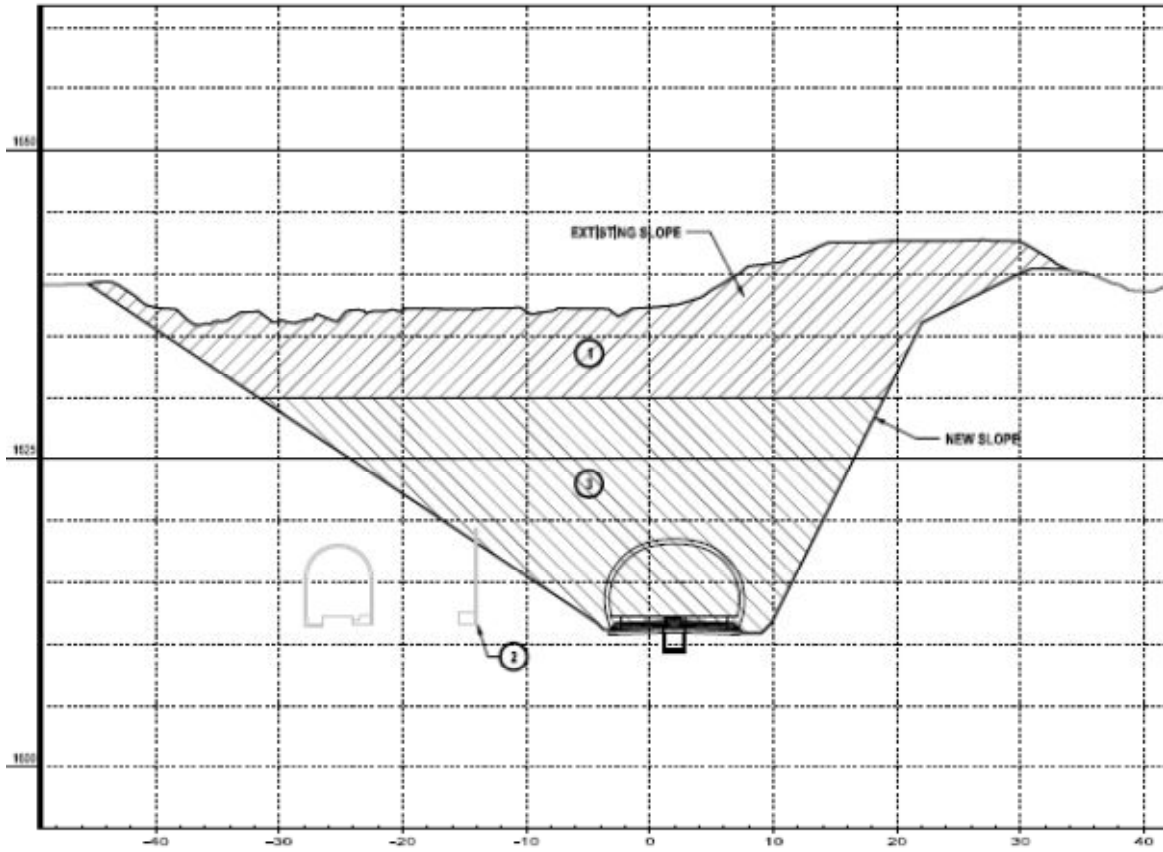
Existing and New Tunnel cross-section at the Western portal (Aurecon; 2014).
